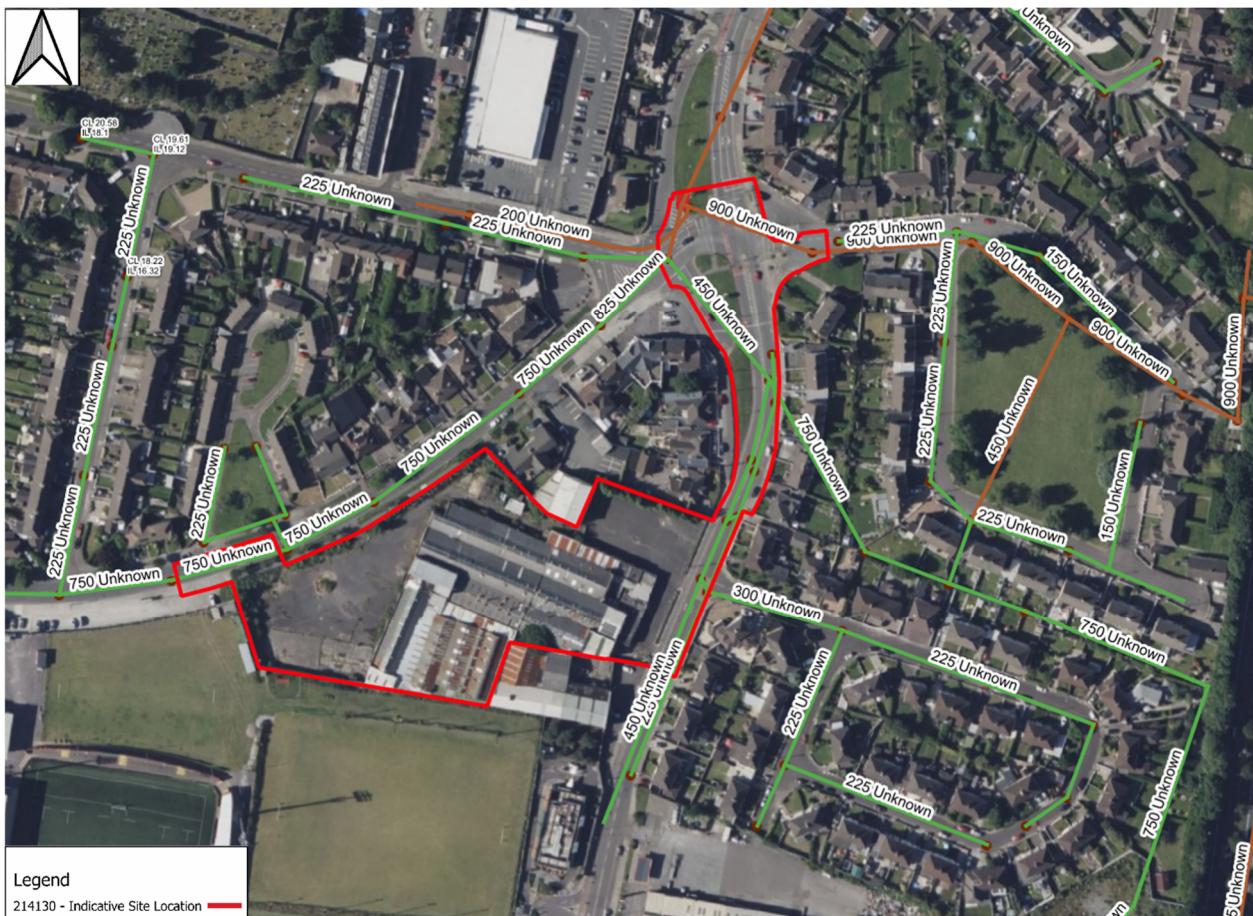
Existing foul drainage adjacent to site (extract from IW records, site boundary outlined in red)
